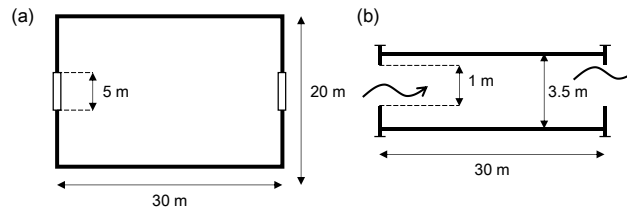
Geometry of a typical floor. (a) Floor plan; (b) cross section.
